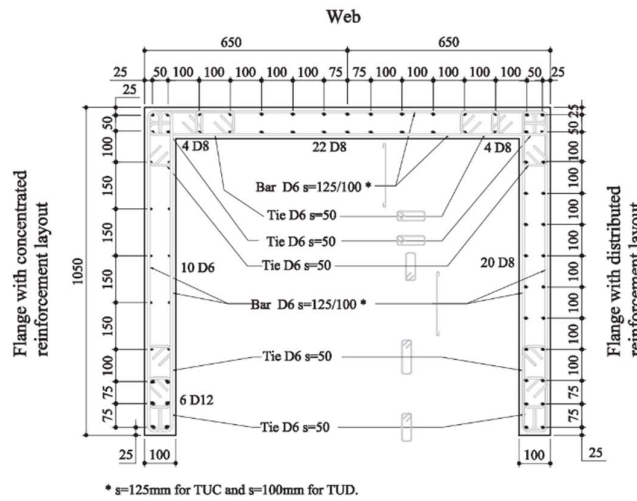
Cross section of the test specimen TUC and TUD scale 1:2. Dimensions in mm. (Constantin & Beyer, 2016)
